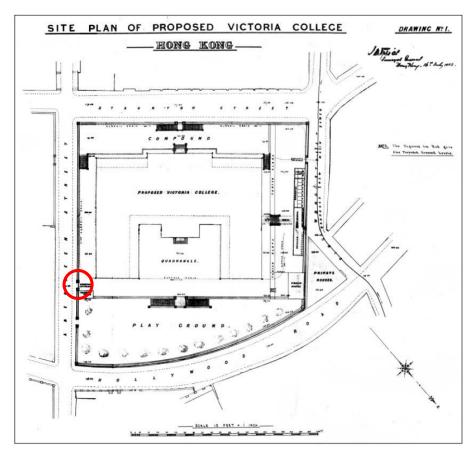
Site plan of the proposed Victoria College (renamed as Queen's College in 1894) prepared in 1883.
